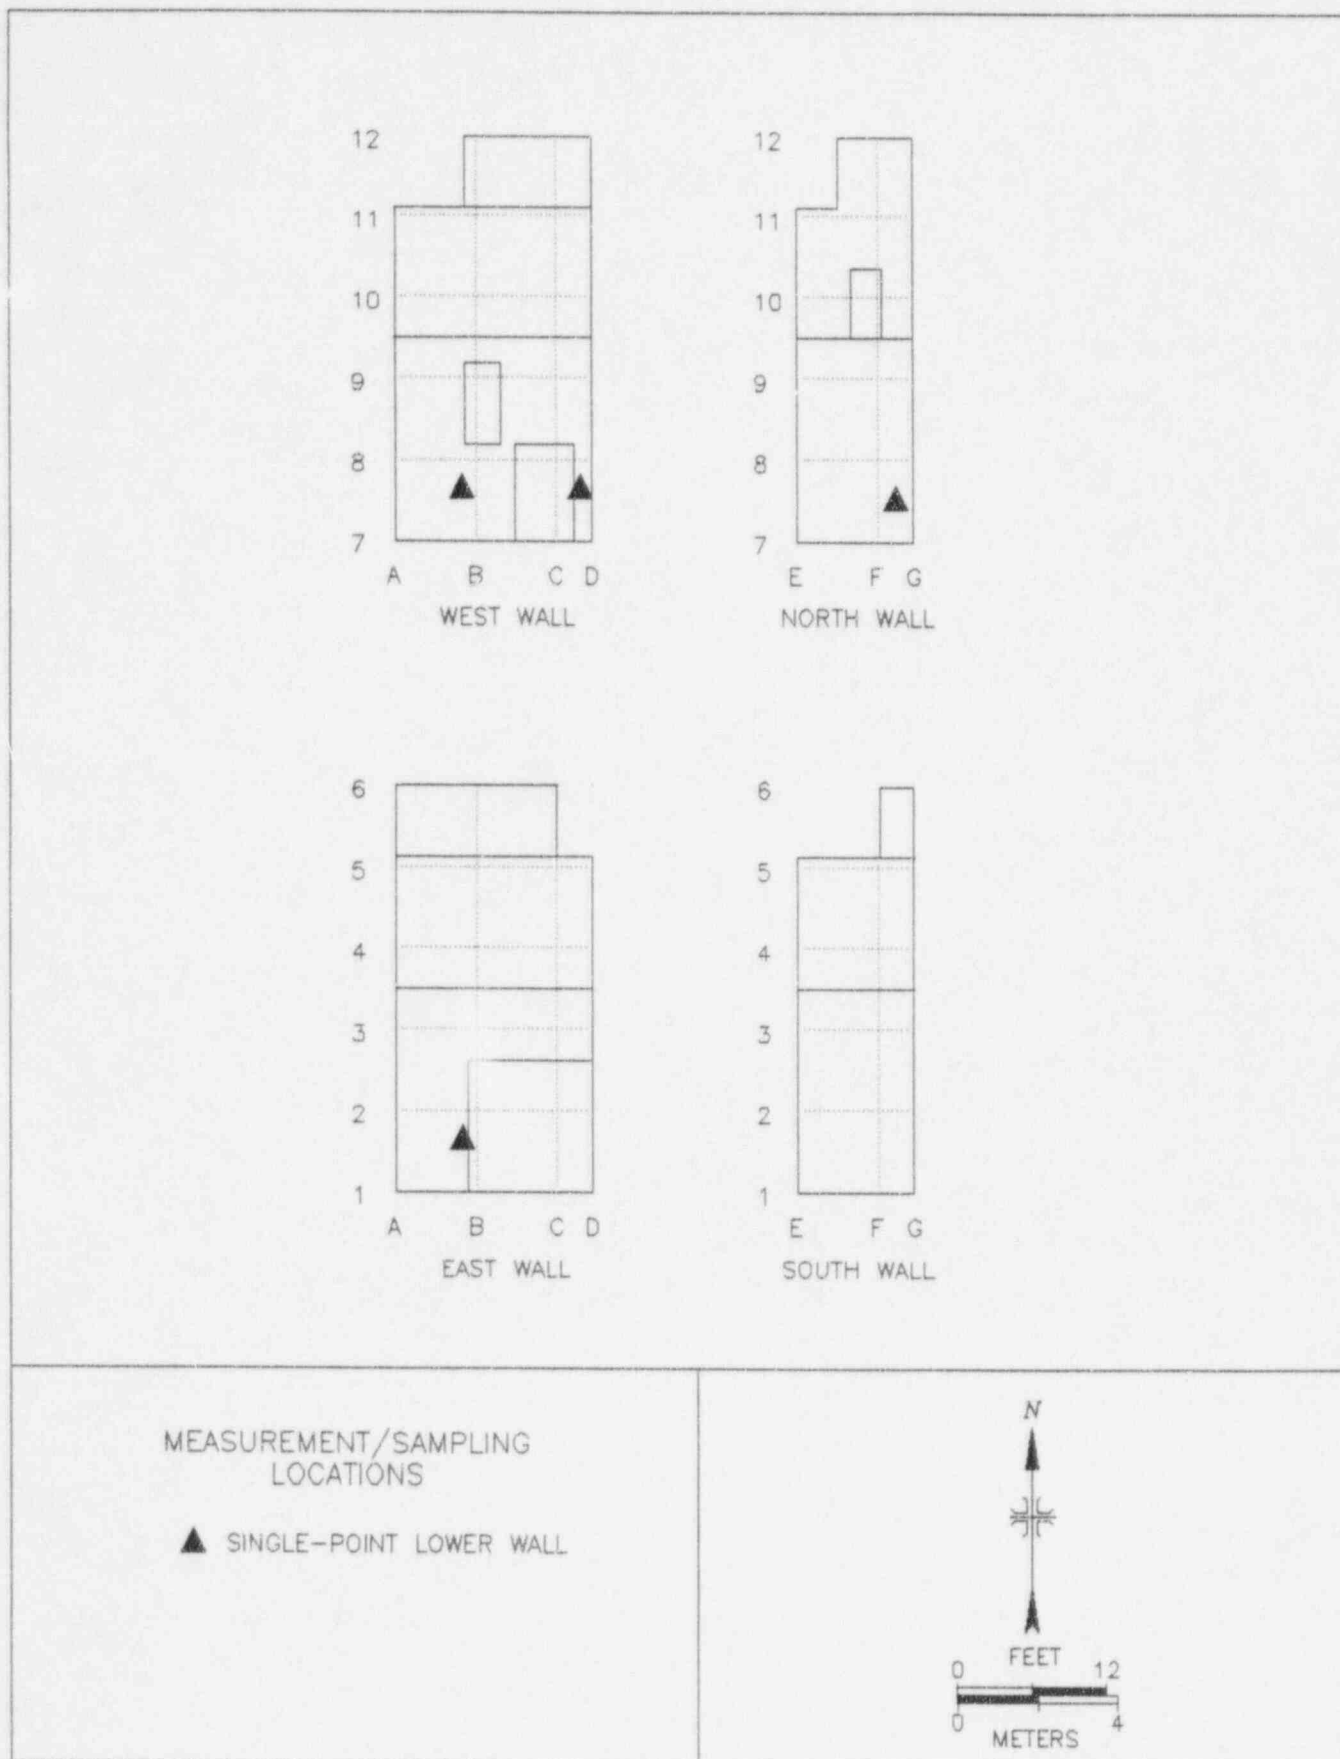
Building 10C, Reactor Room Walls – Measurement and Sampling Locations
